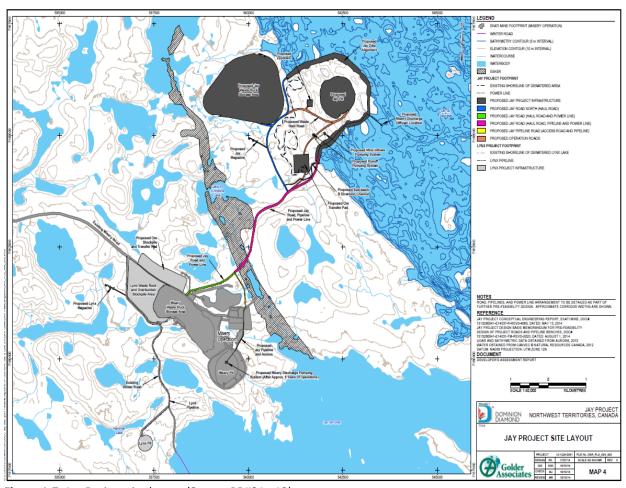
Jay Project site layout (Source PR#81 p12)
